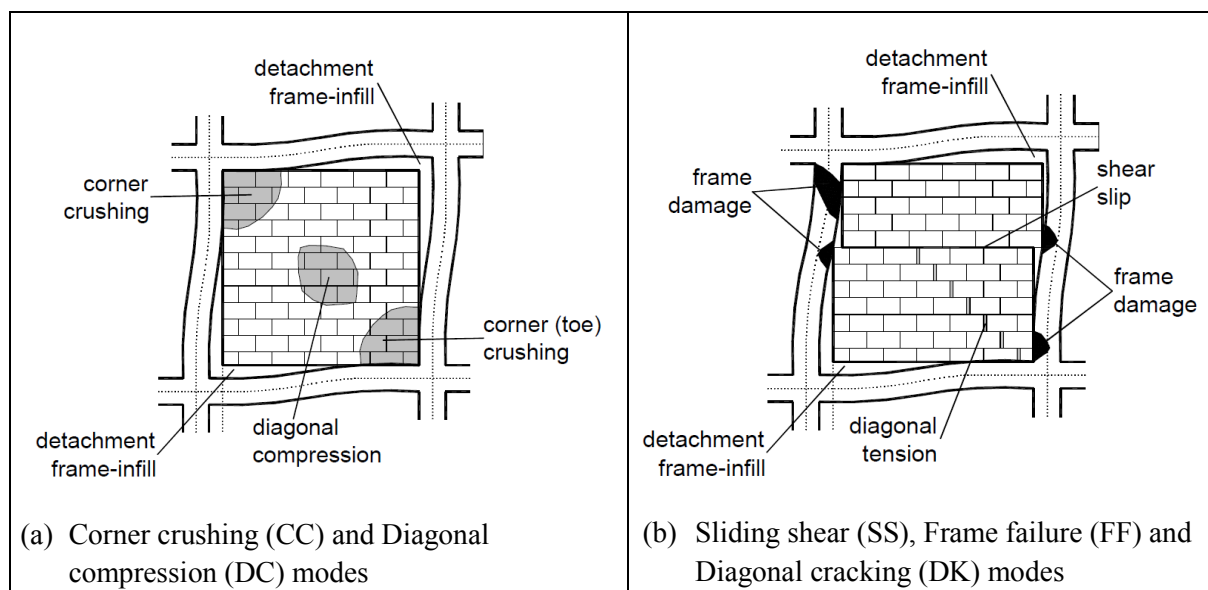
Typical modes of failure for infill masonry frames (taken from Asteris, et al., 2011)
